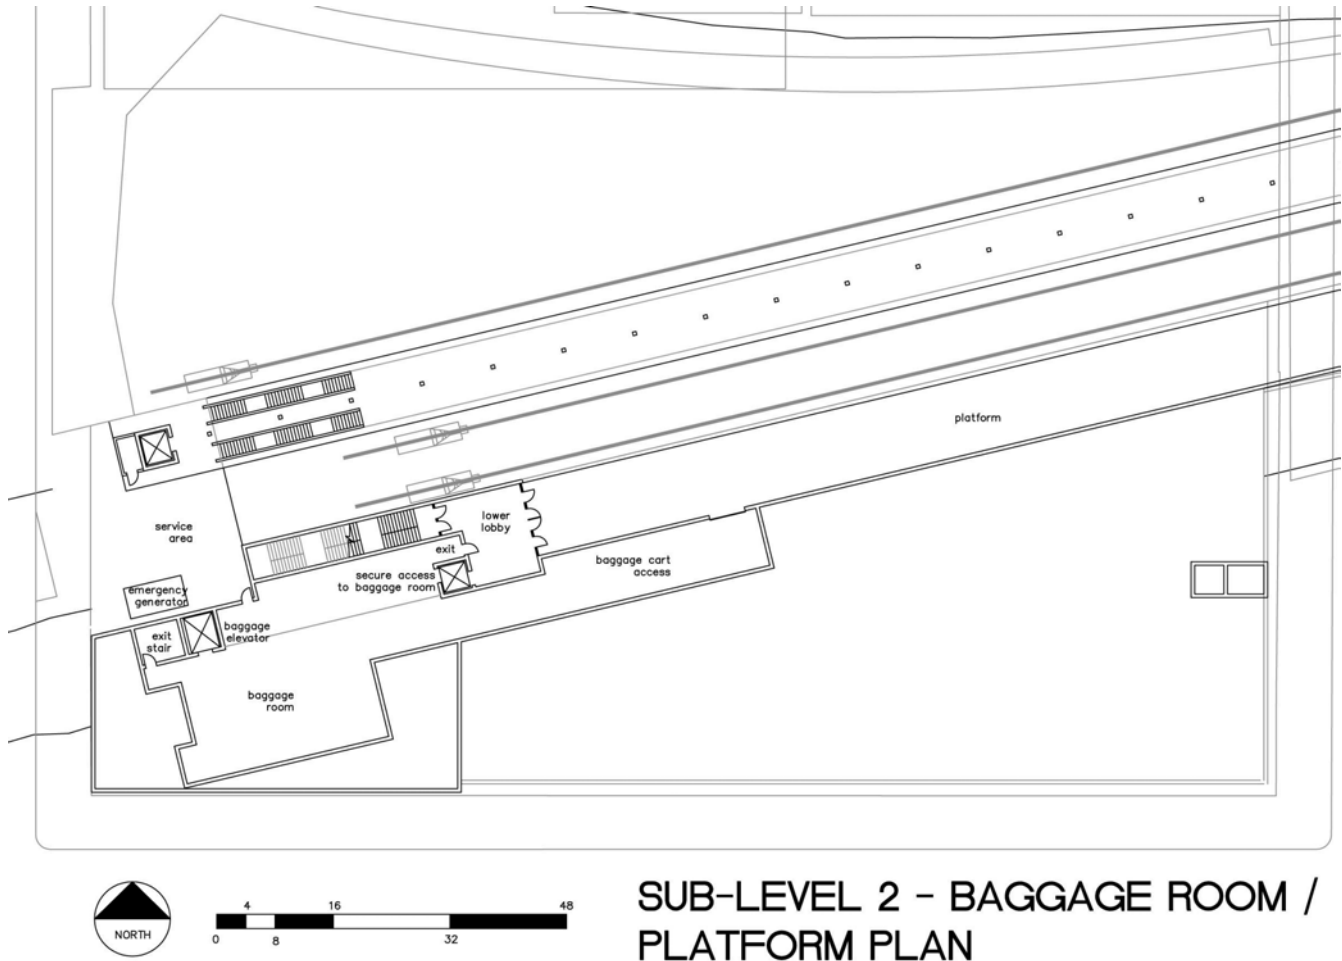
Platform Level Plan. Plan shows secure baggage handling area and controllable access to the rail platform. (See appendix "C" for additional plans and elevations.)
